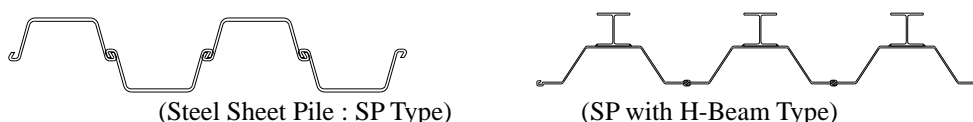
Cross-section of Steel Sheet Pile Foundation
